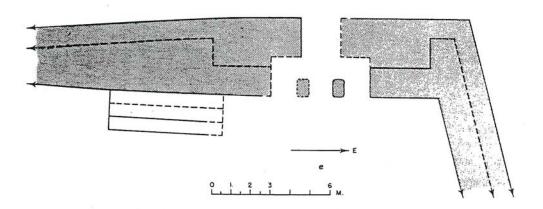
Plan drawing of Gate G (modified after Shook 1952:Figure 1a).
